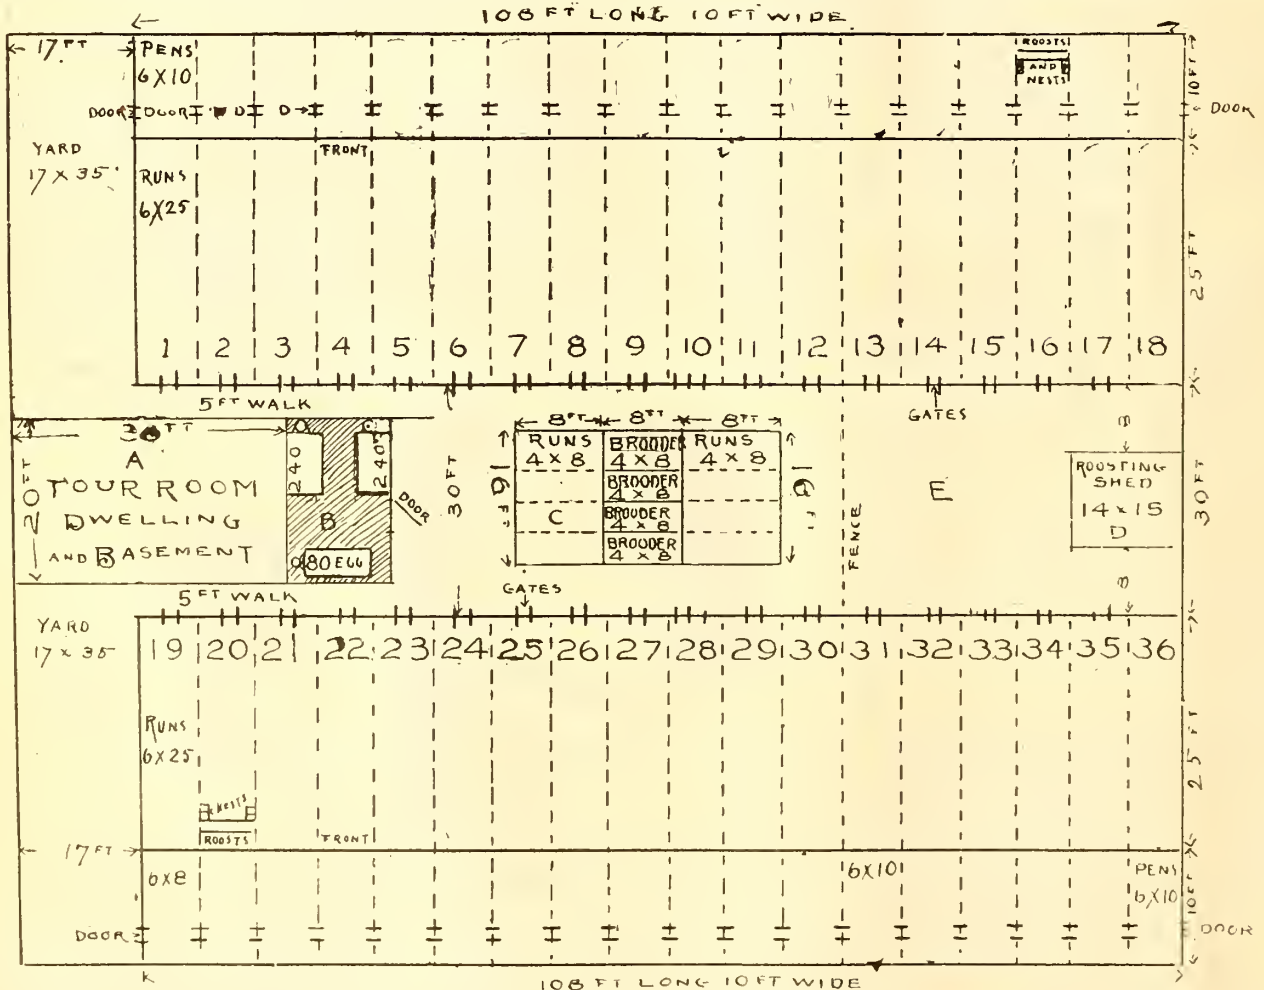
Ground plan of the Cavanaugh plant showing complete detail of arrangement.
